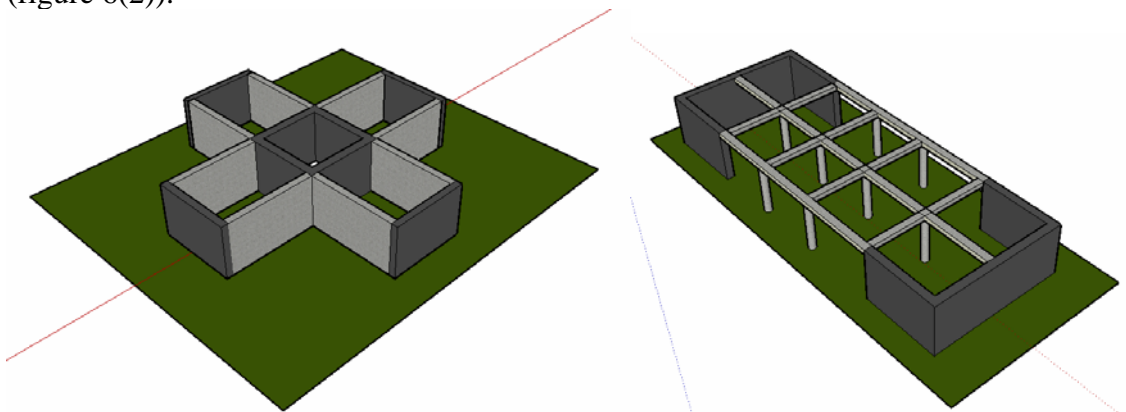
(1). Symmetrically placed shear walls; (2). Shear walls/bracing placed at the end.
